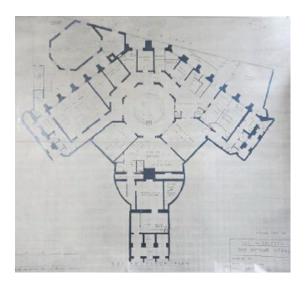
(left): Ground floor plan of the rheumatism clinic. The hospital use infilled floors (creating ground to third floors) and partitioned rooms. It also created a central atrium.
